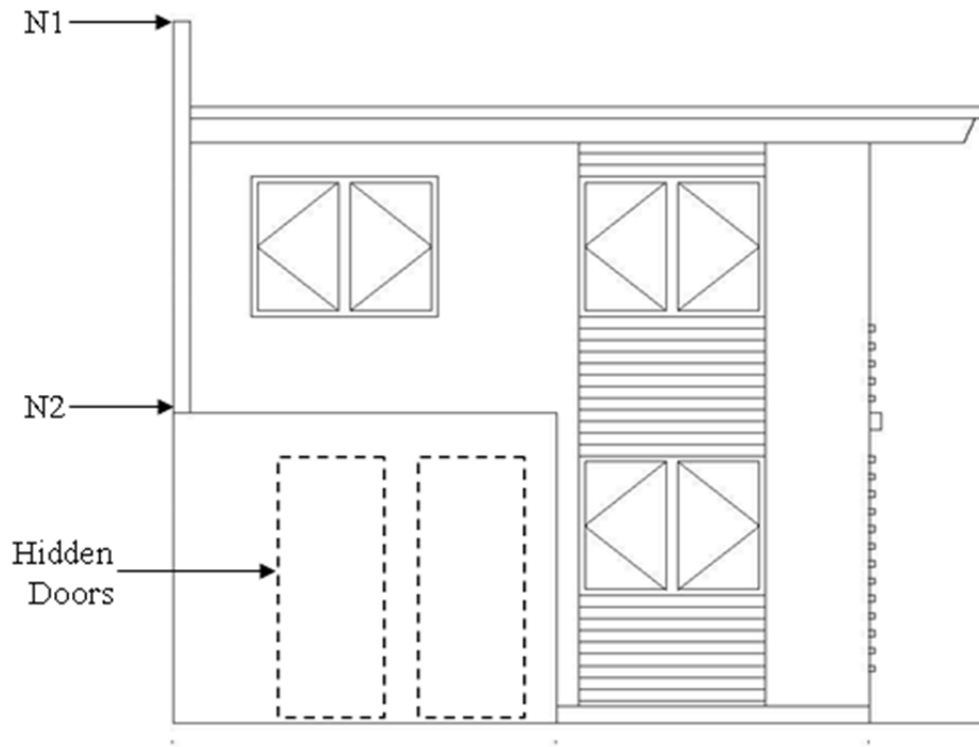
Rear elevation (south view). There are two hidden doors in the north main wall.
